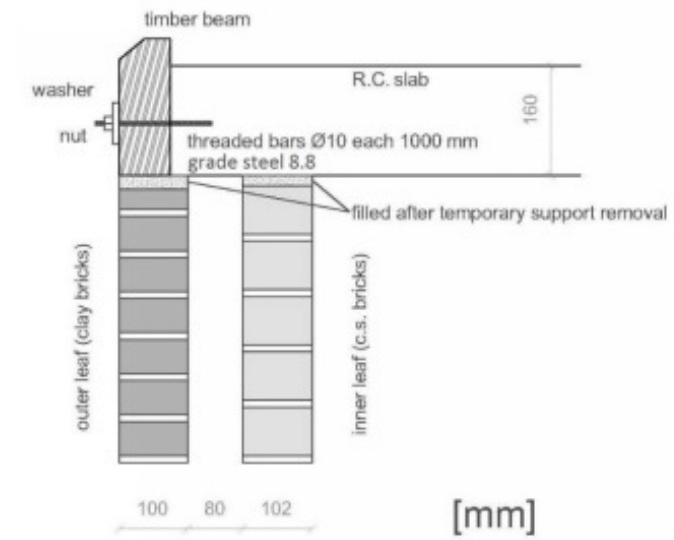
Detail of the connection between the r.c. slab of the second floor and the inner leaf (c.s. walls) - East and West side.
